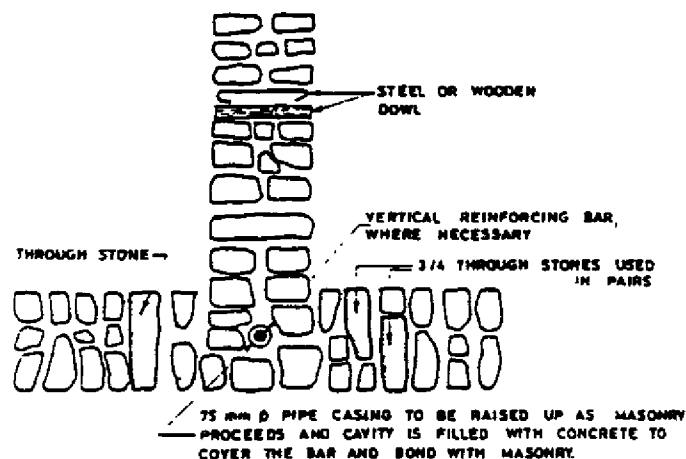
Reinforcement of Rubble Stone Masonry [1]
